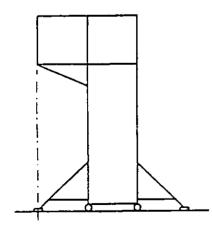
Figs. B are not recommended due to the position of the welds, but are acceptable if supported by tube and couplers as shown in Figs. A
